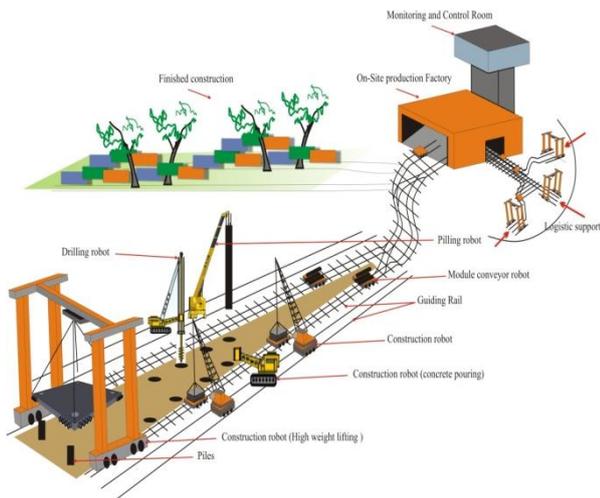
Automated Construction (On-site factory and construction). (own concept).
